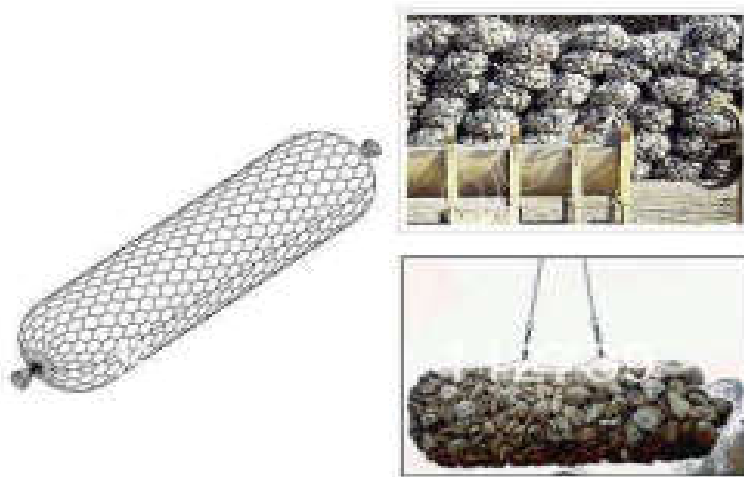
Gabion sacks in hydraulic works (Toprak, Sevim, & Kalkan, 2016)
